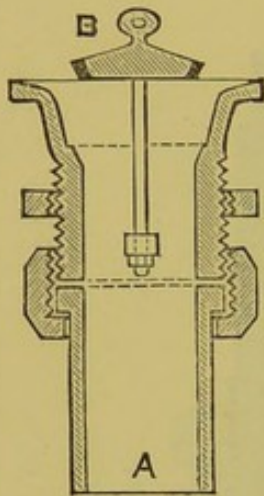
Section of $1\frac{1}{4}$ -in. Plug - and - washer, with full-bore union.
